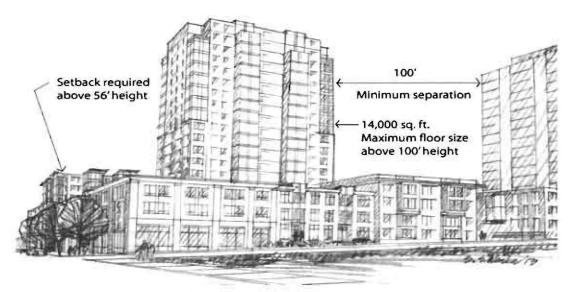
(F): Floor plate standards for buildings over 100' tall.
